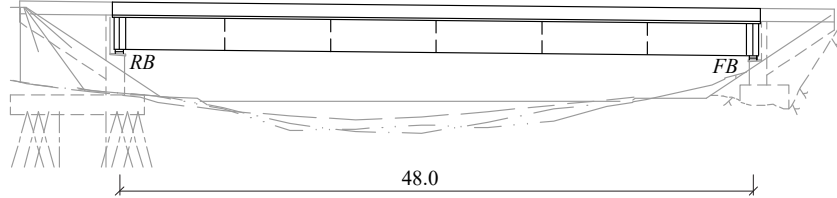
Elevation of the bridge, roller bearings (RB) and fixed bearings (FB).
